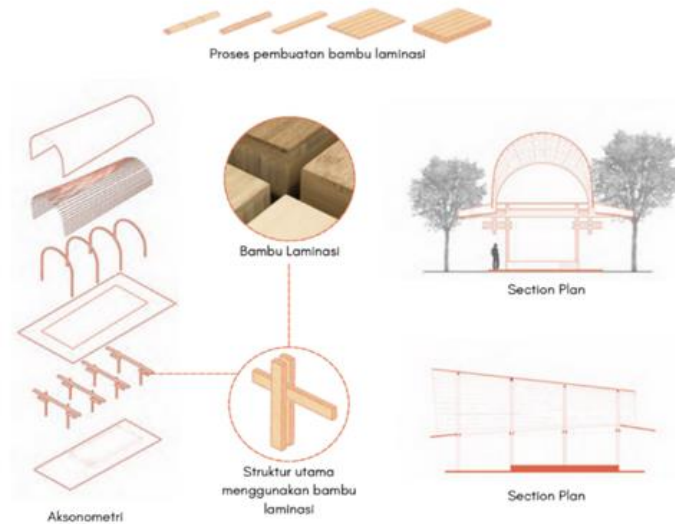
Application of Laminated Bamboo Material to The Main Structure of The Building at Mertasari Beach (Source: Bamboo Village Trust, 2024)
